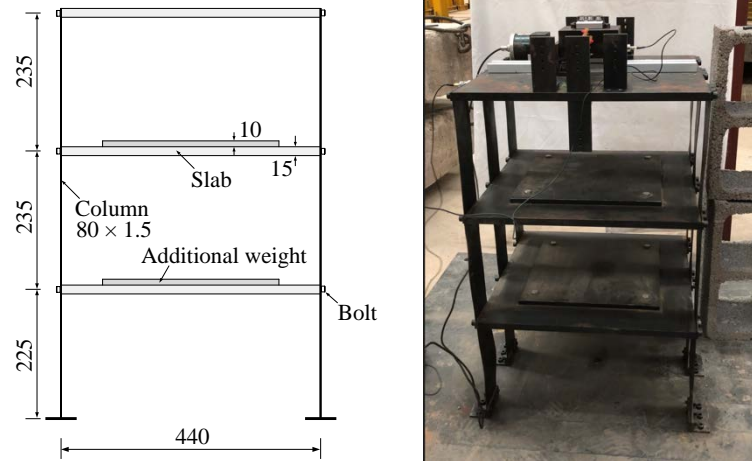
Geometric configuration and physical setup of the test frame (unit: mm)
